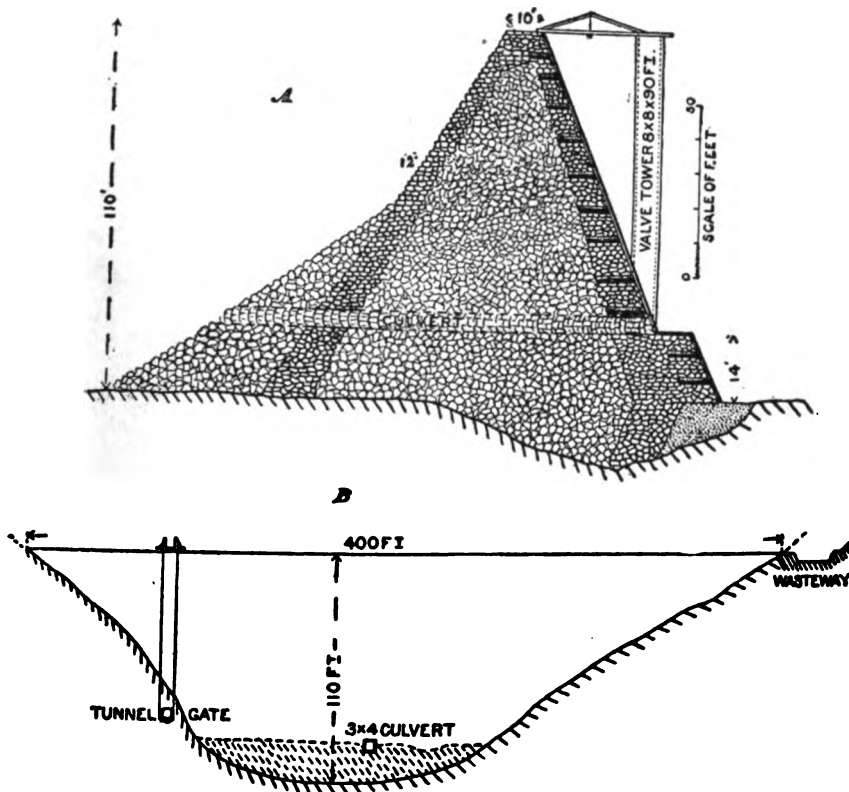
CROSS-SECTION AND ELEVATION OF WALNUT GROVE DAM, ARIZONA.
